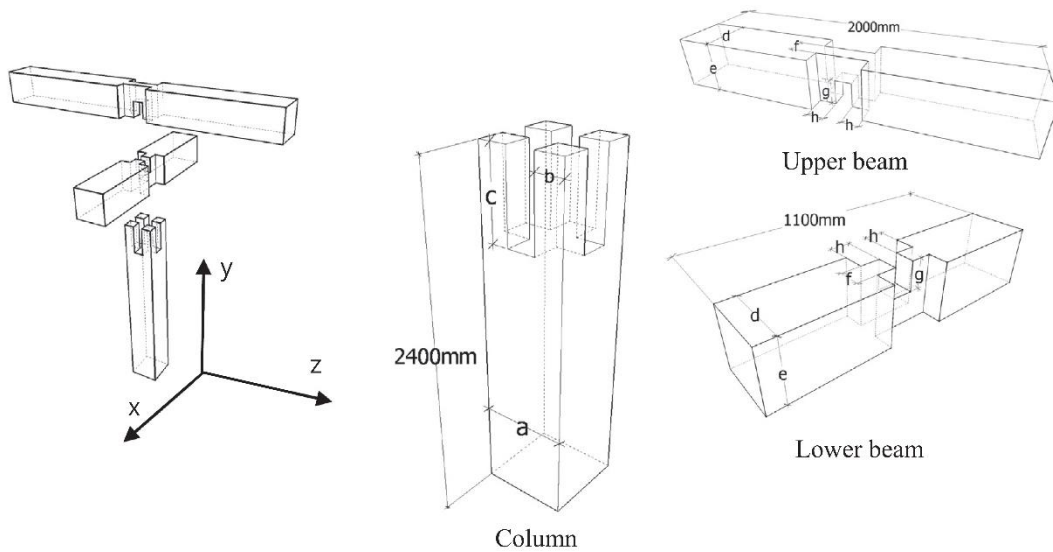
2 Geometric variables from the mortise and tenon from column and beam used for the sagae joints (Jeong, 2018)
